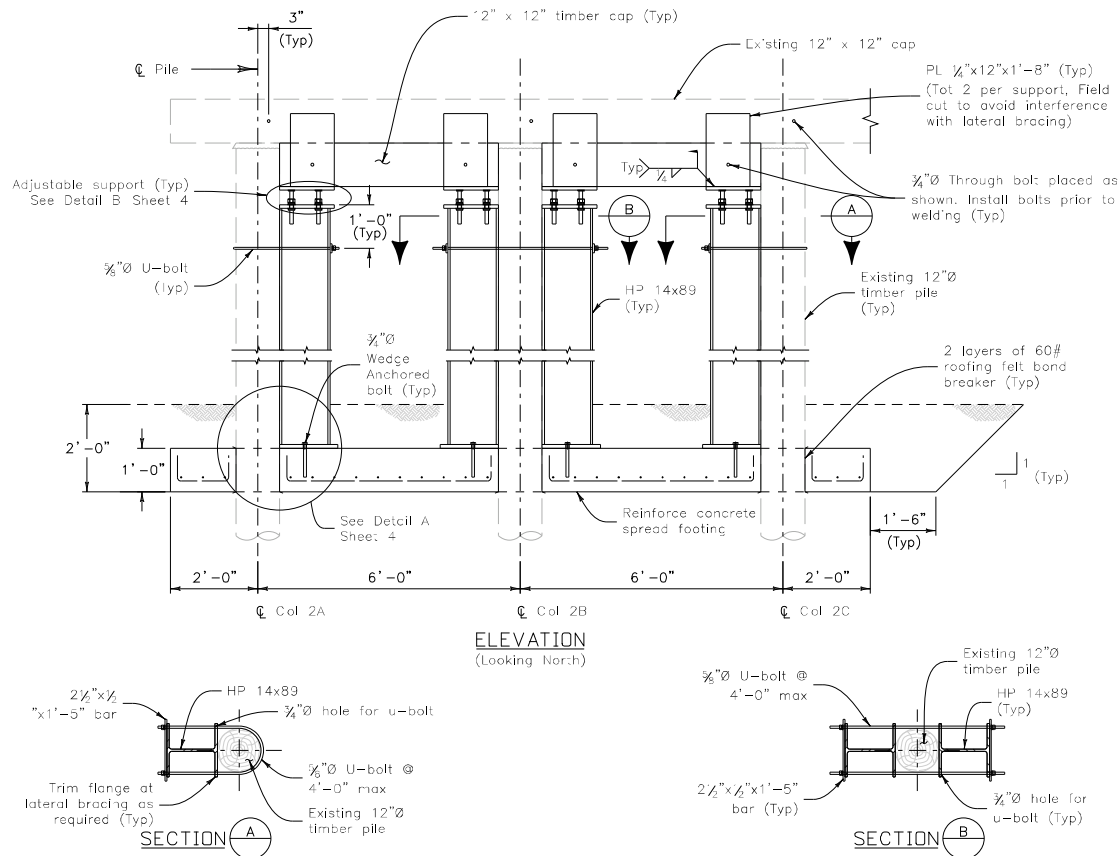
(G)-5 Sample of Adding Columns to a Pile
